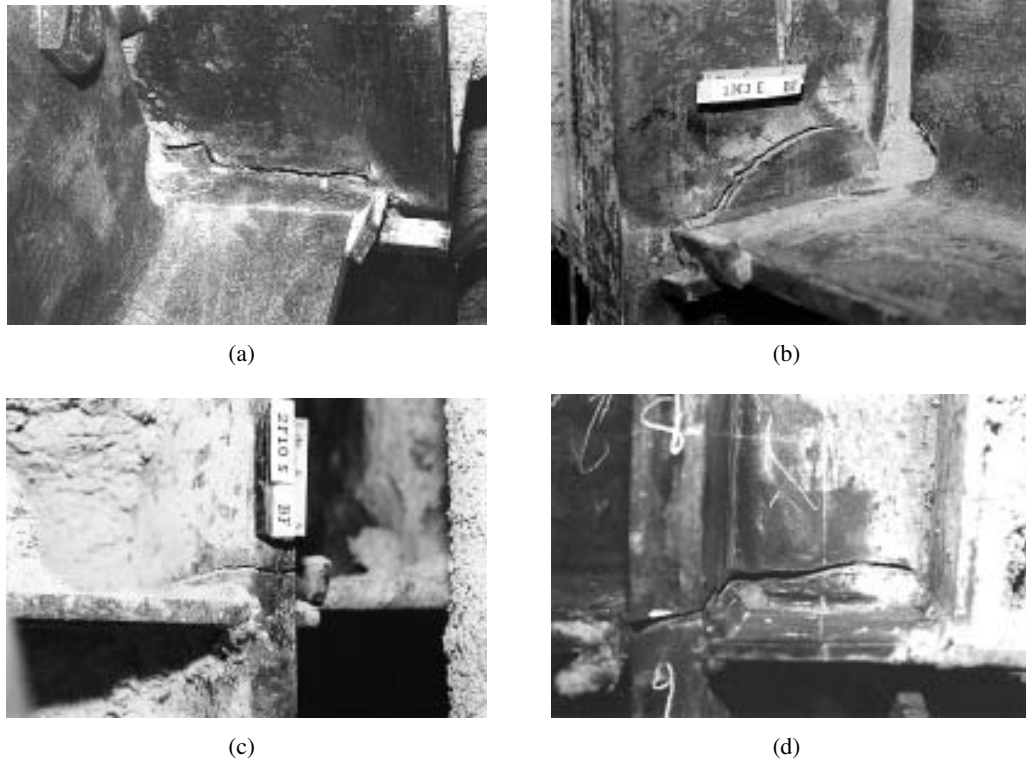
Example of connection fractures experienced in steel moment-frame buildings in the 1994 M_w 6.7 Northridge earthquake. The fractures commonly initiated in the beam bottom flange CJP welds. In some instances, the fracture progressed completely through the CJP welds (a). In other instances, the fractures progressed into the column flange material behind the CJP welds. In these cases, a portion of the column flanges remained bonded to the beam bottom flange, and was ripped out from the column flange (b). A number of fractures were observed to have progressed completely through the column flange (c) and sometimes these fractures continued into the panel zones (d) [20].
